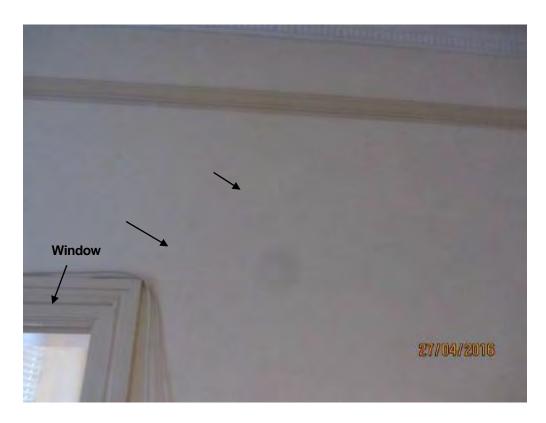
shows damage to the cornice to the southwest corner of Bedroom 1
